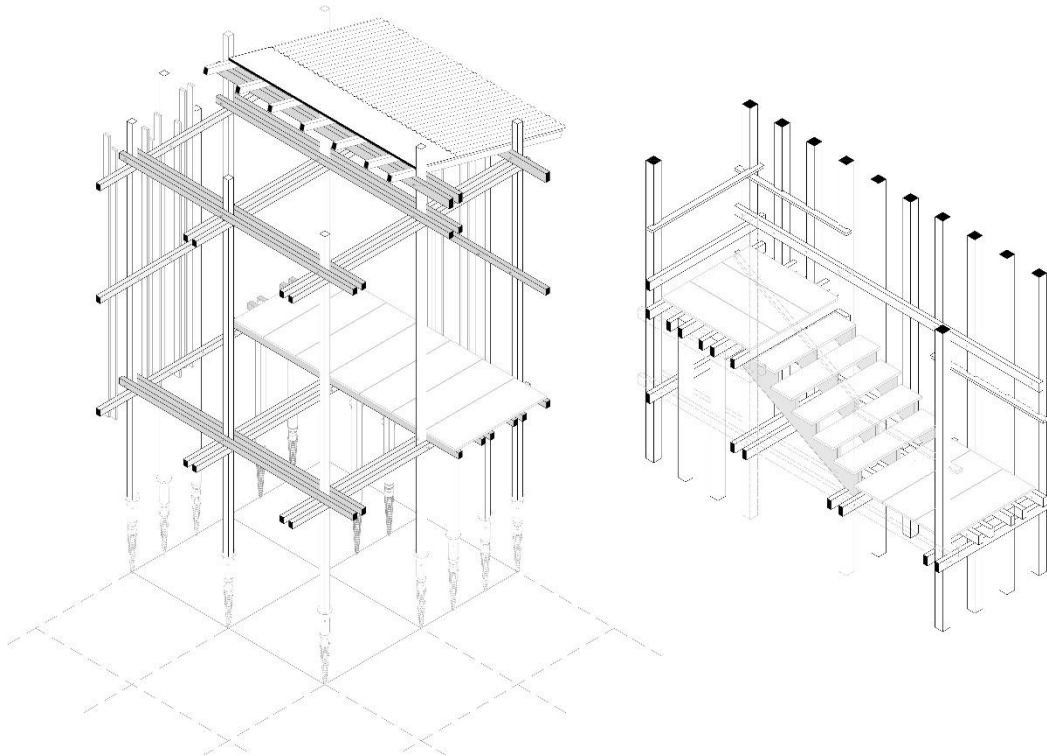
Typical axonometric sections of the structural system of the pavilions.
